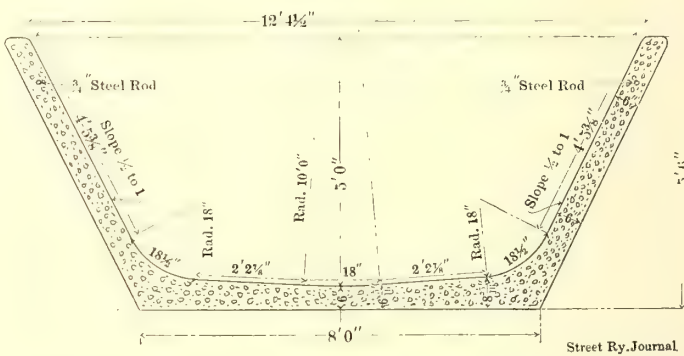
CONCRETE DITCH CONNECTING WITH CULVERT
